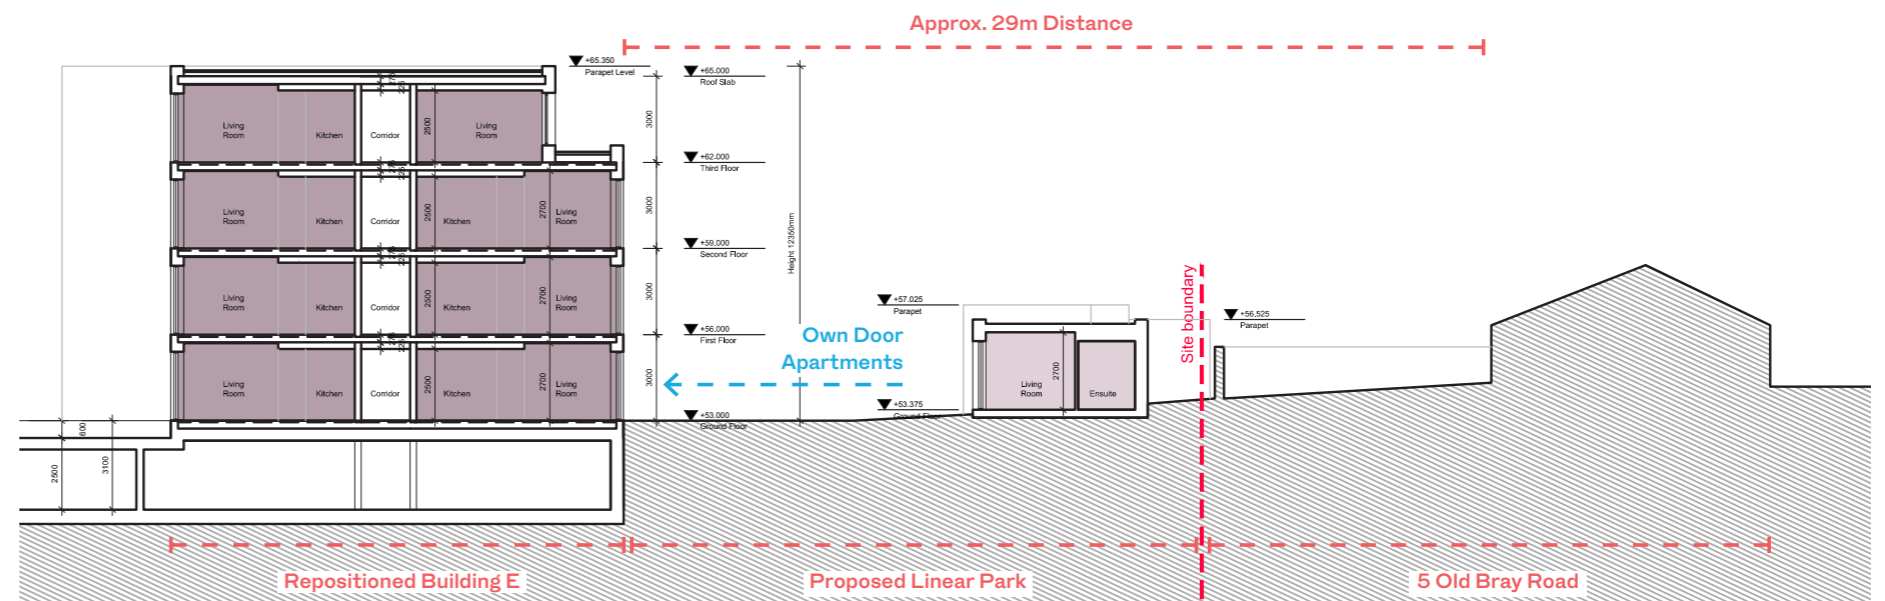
Proposed Residential Development at Cornelscourt - Scale and Massing of Building E Adjusted and the Introduction of Single Storey Bugalows to Improve Interaction Between Proposed Site and Old Bray Road
